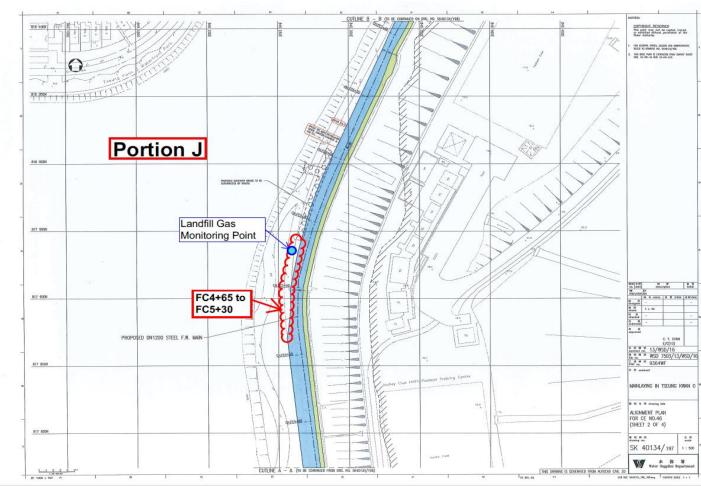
Location Plan for Portion J – Landfill Stage 1 (FC4+65-FC5+30)
